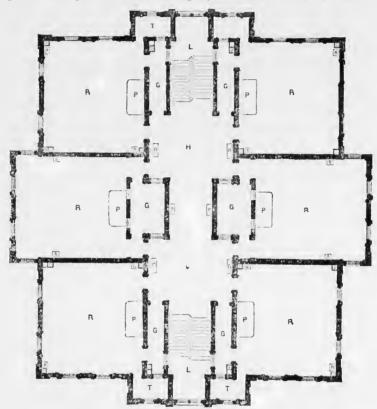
Plan of First and Ground Floors, adapted to Fig. 170.
